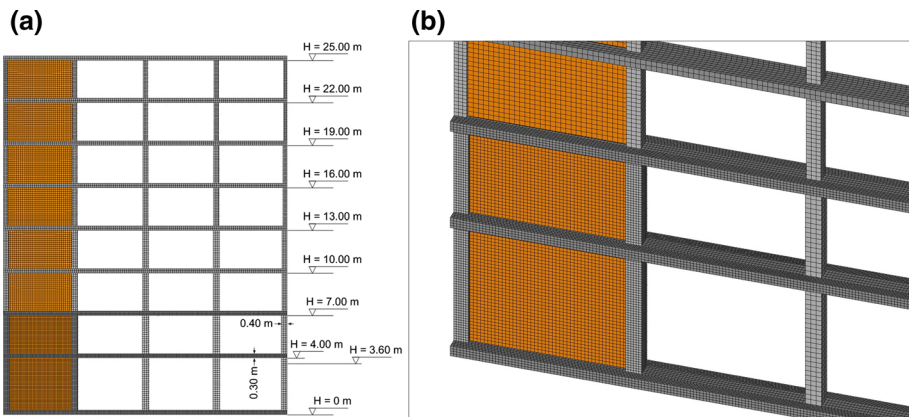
Views of the Finite Element Mesh of building 2. a Elevation, b close-up
